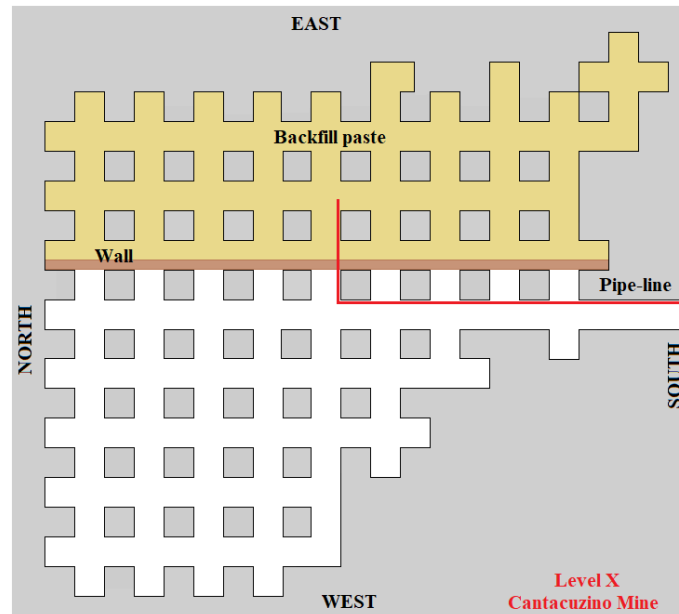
Plan projection of the level X, Cantacuzino mine with the construction under the roof of a backfill paste pillar [6]
